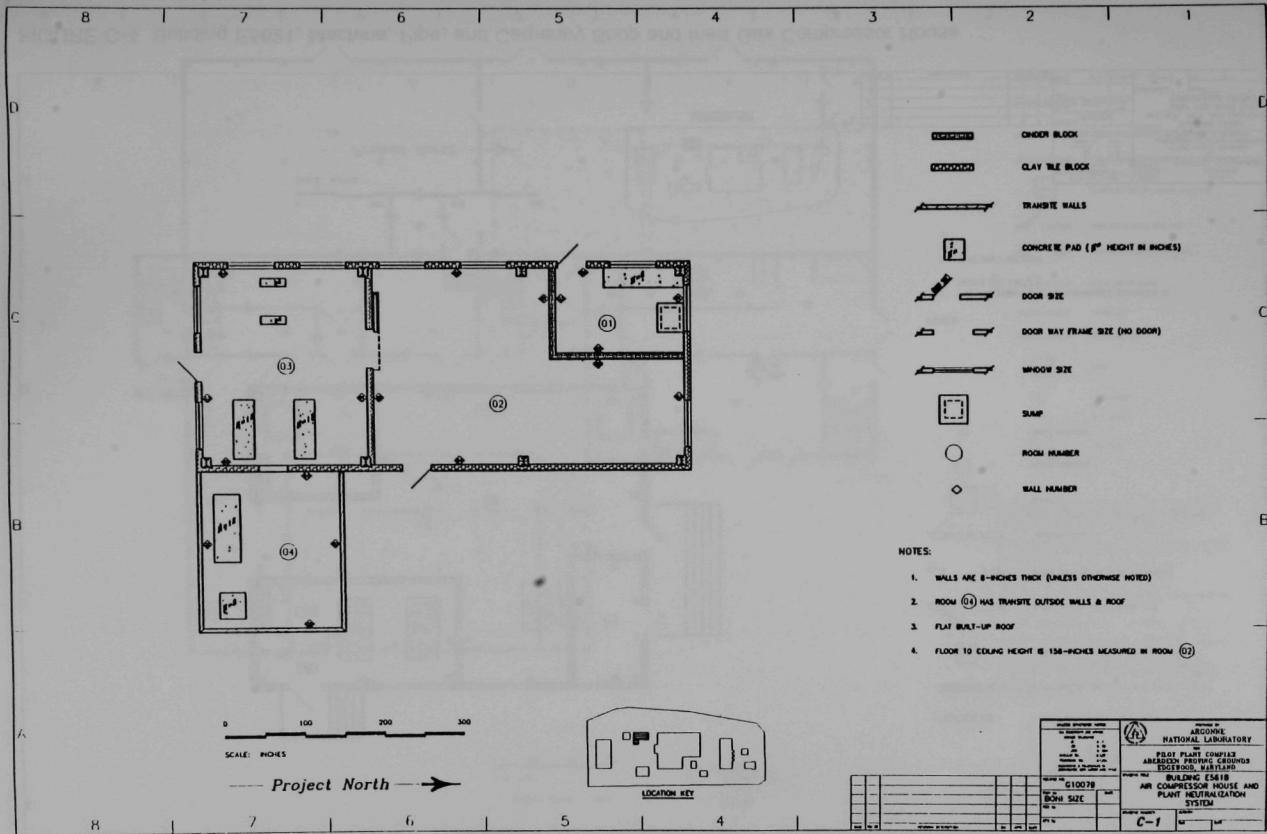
Building E5618, Air Compressor House and Plant Neutralization System
